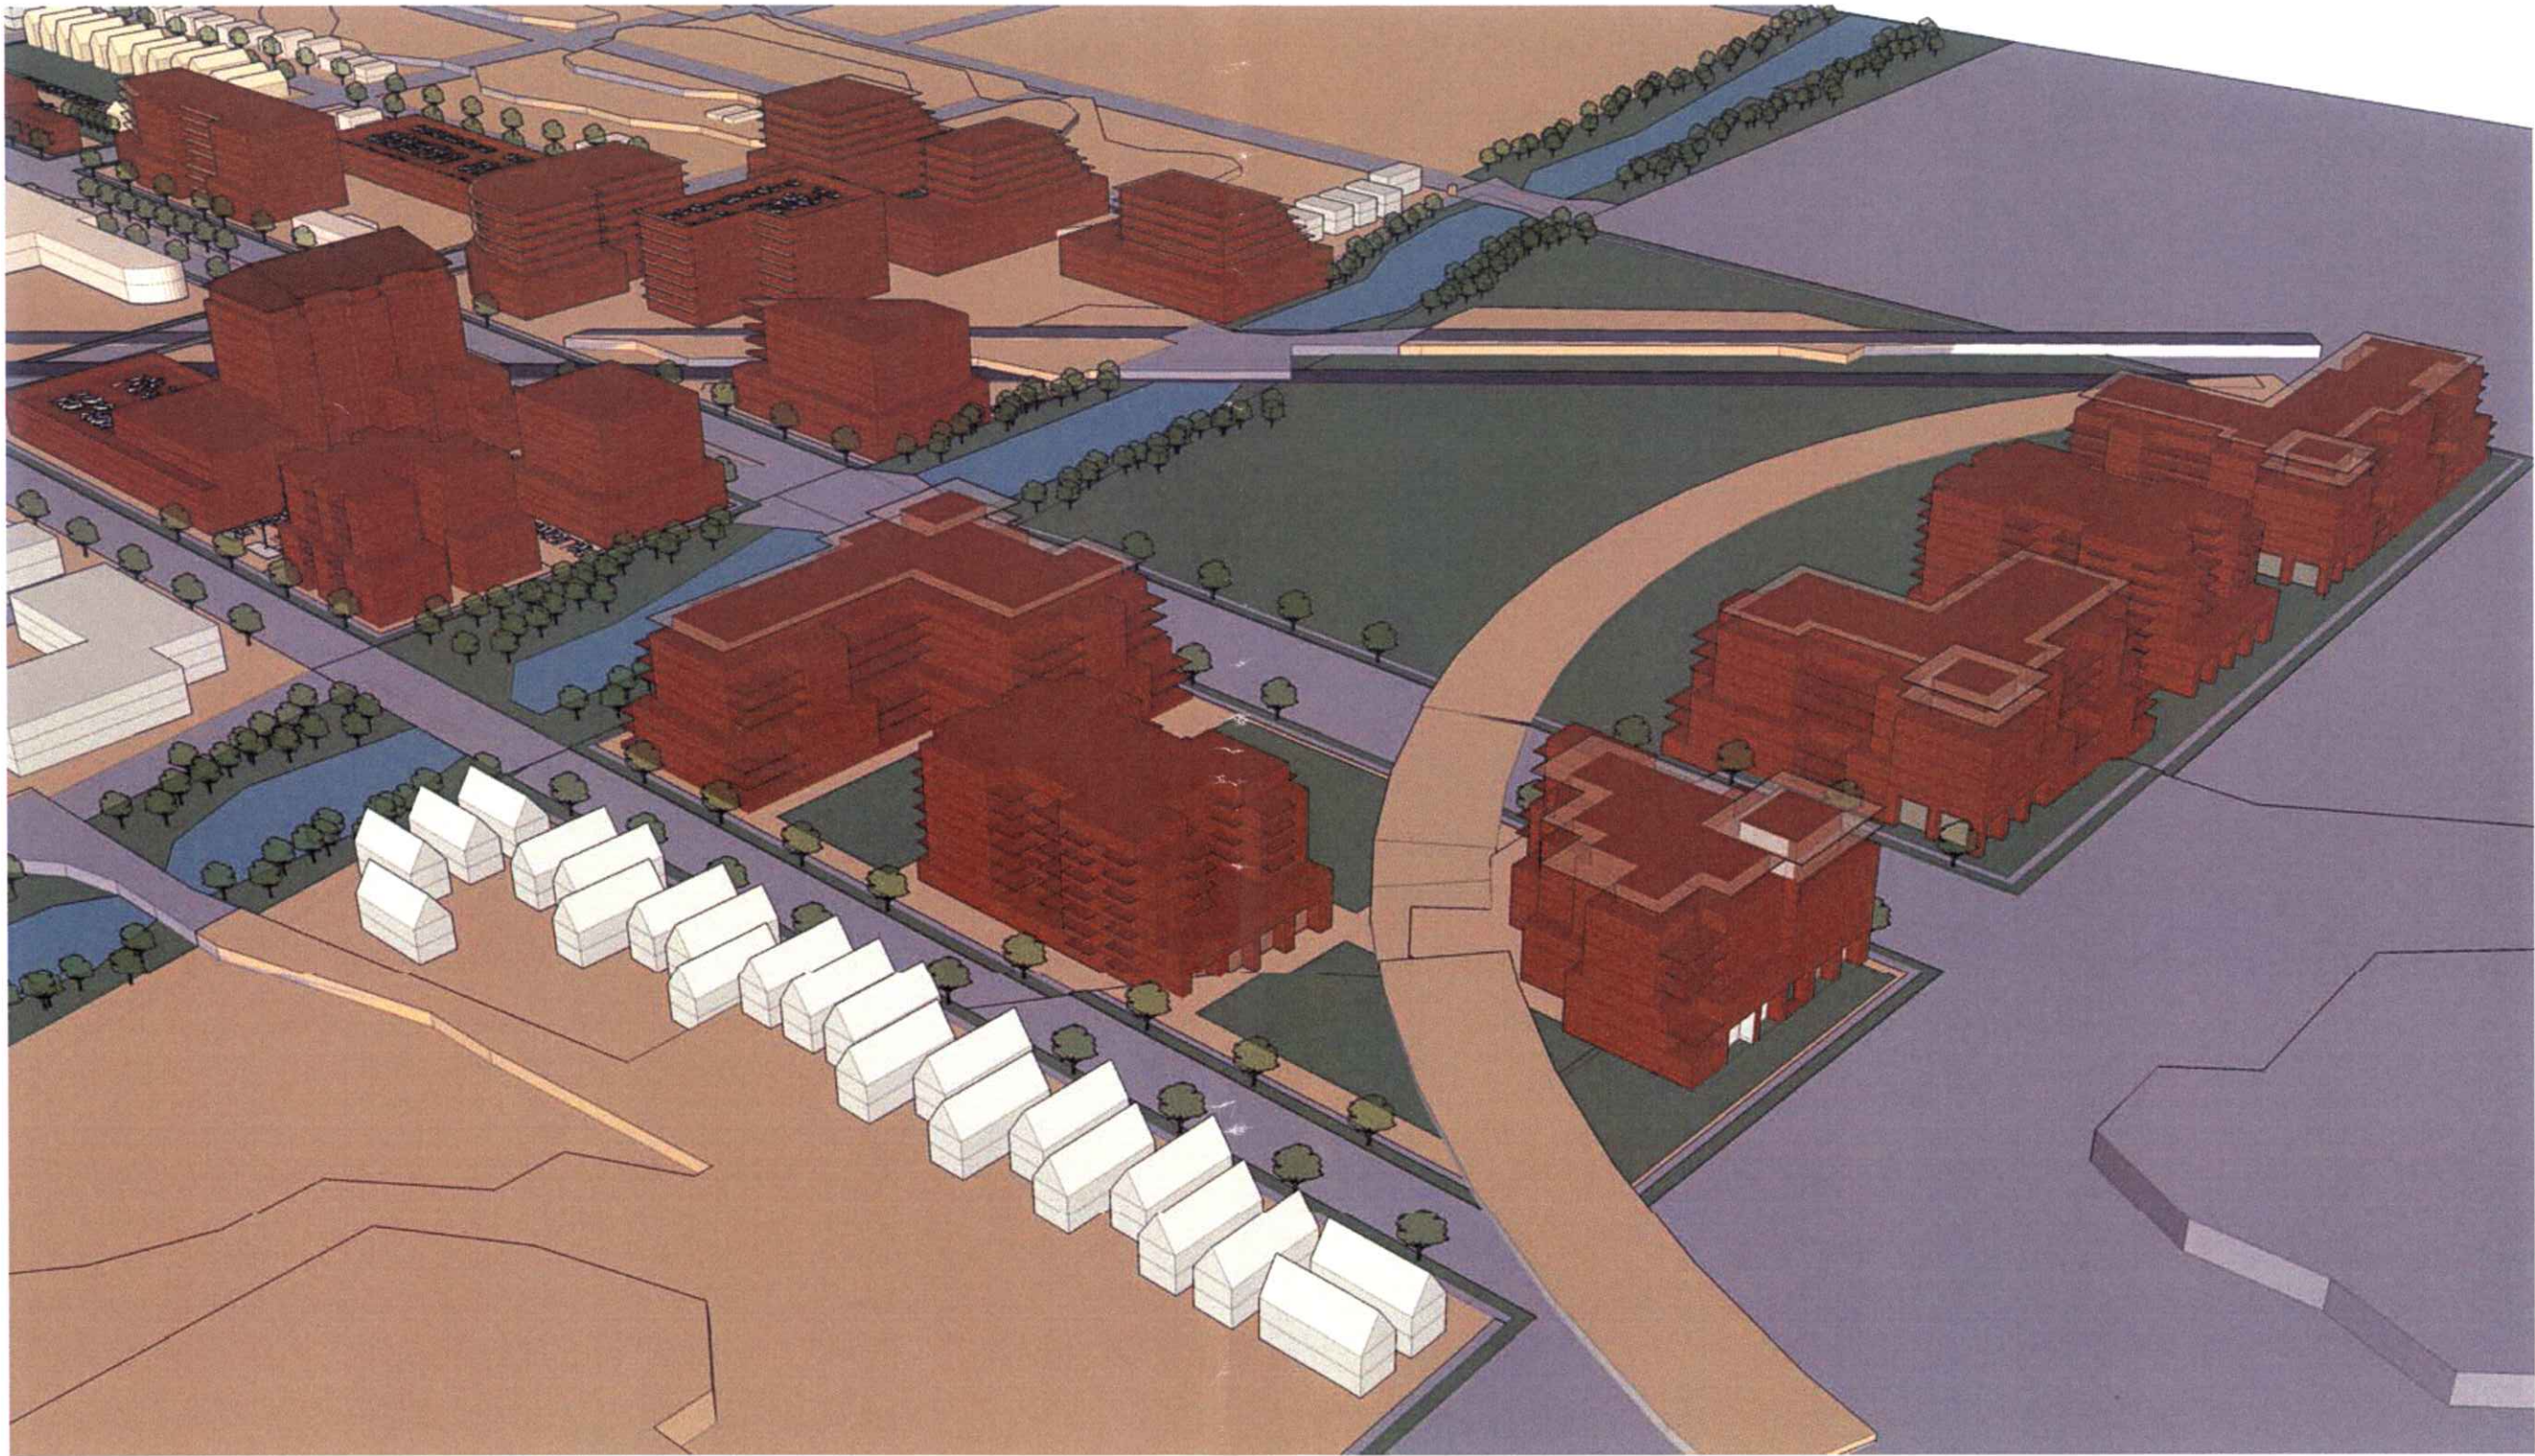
degree setback limits above 5 stories. Upper Story articulation and roof treatment may or may not meet roof articulation standards. Additional language will have to clarify this point.
